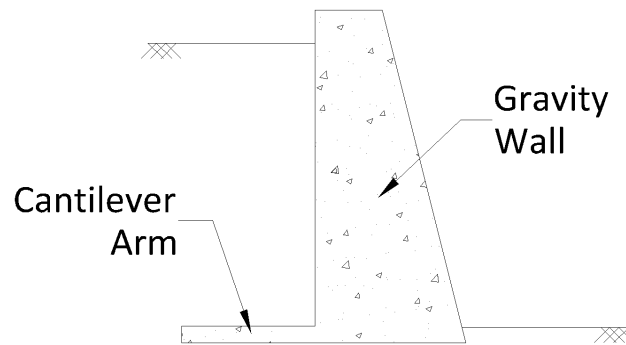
Schematic drawing of an L-shaped cantilevered retaining wall
